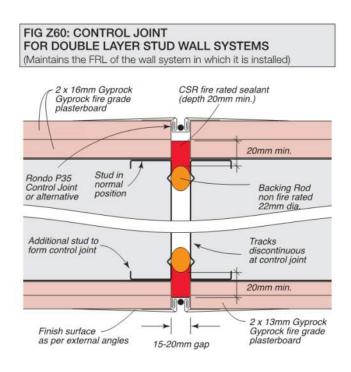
Control joint for double layer stud wall systems, CSR Red Book
